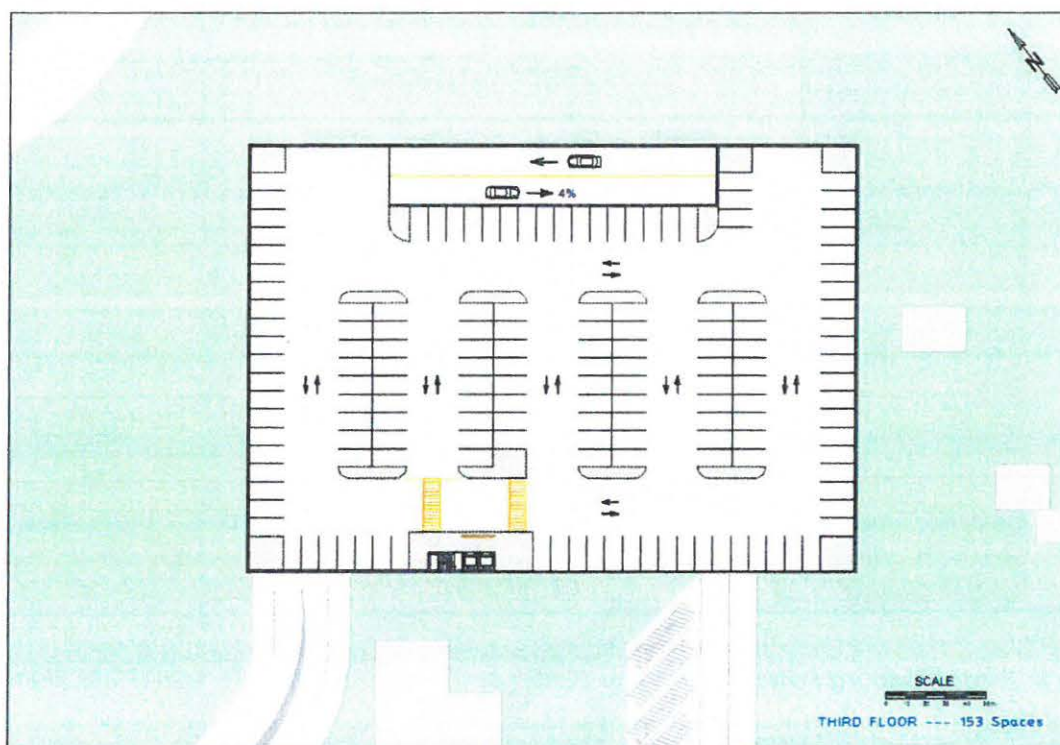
Figure X: Fredericksburg Potential Parking Center and Transportation Terminal Site Plan:
